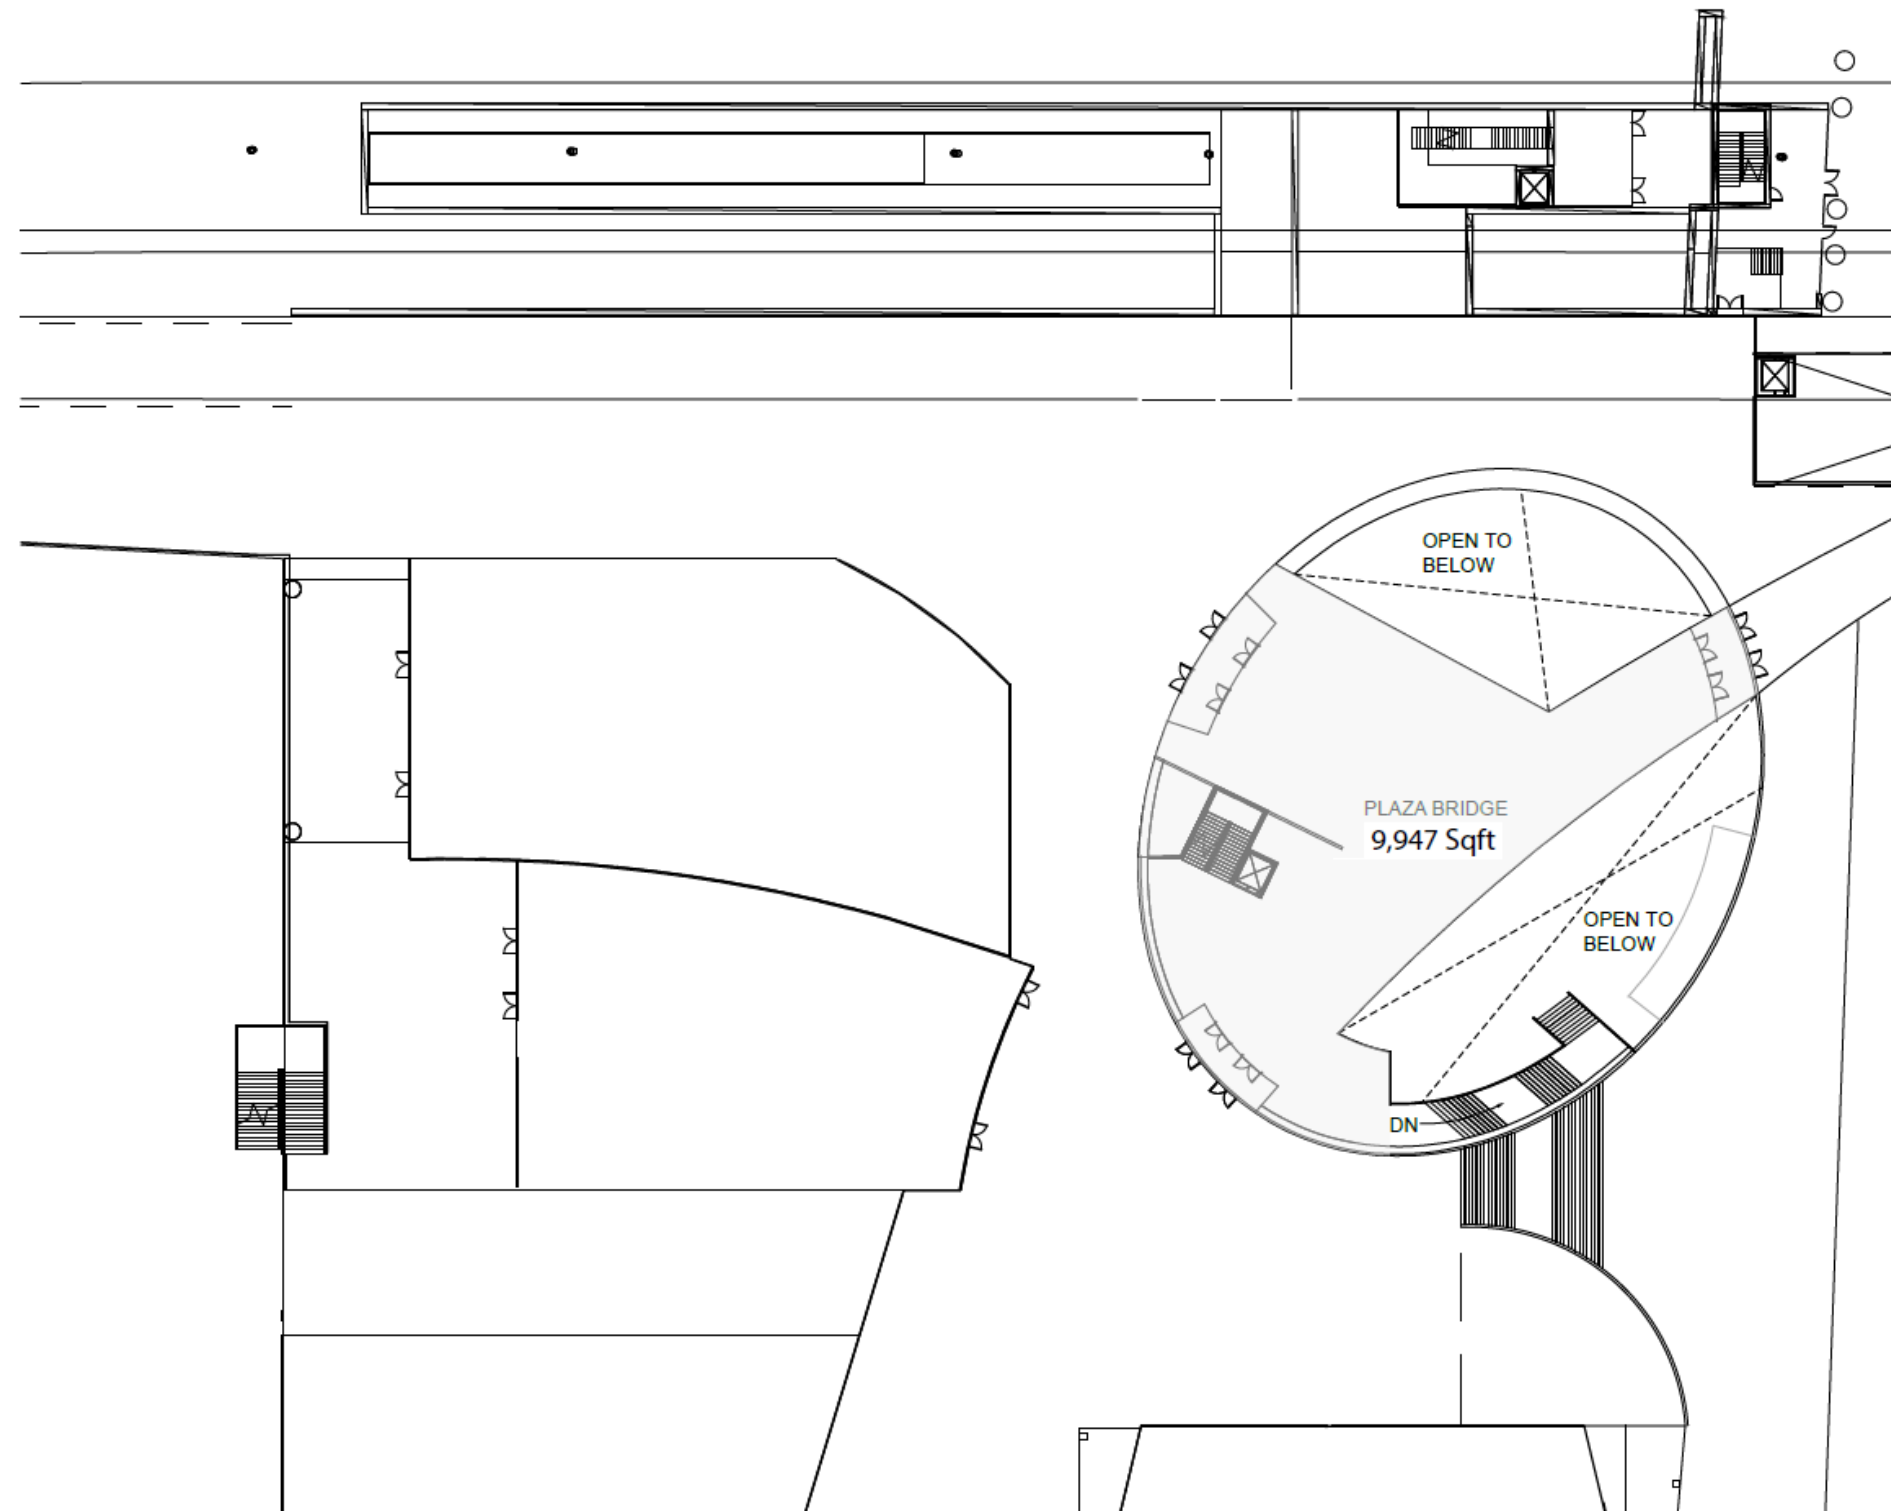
Rail Station Conceptual Floor Plan (Concourse Level)
